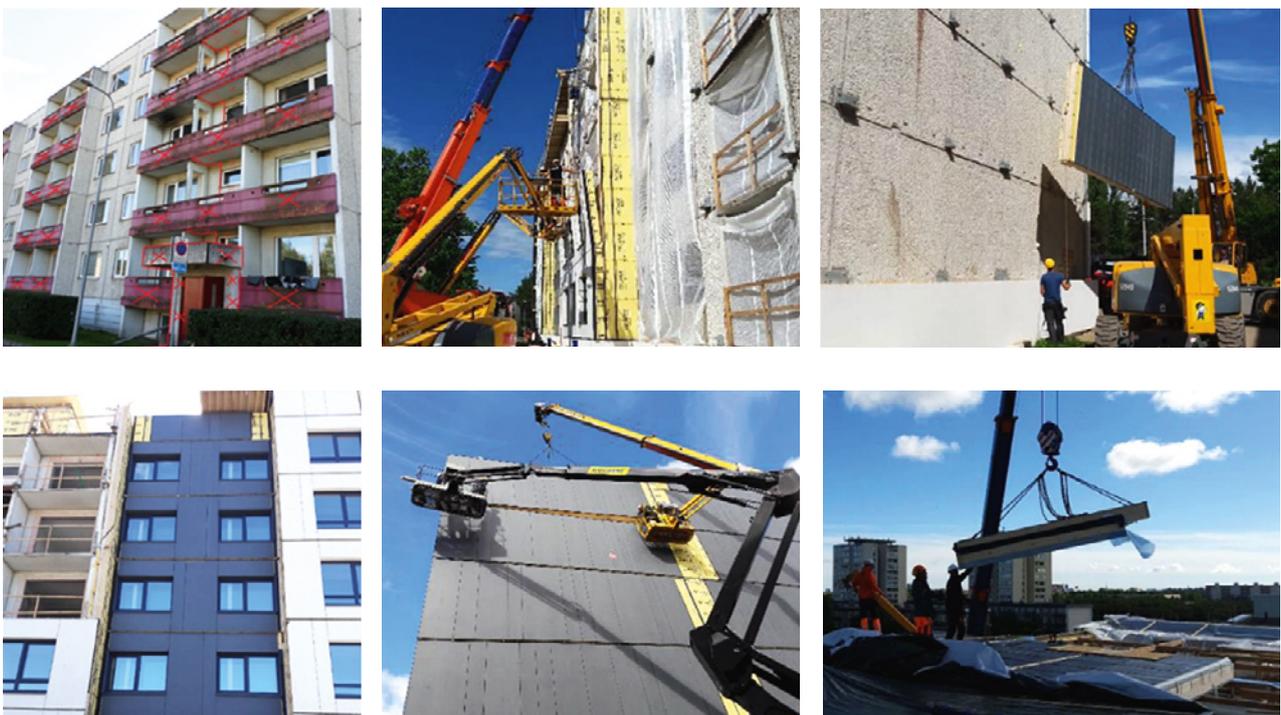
Installation of modular elements on the Estonian pilot building - summer 2017.
